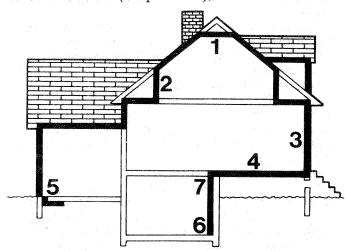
Areas in a home needing proper insulation: 1.) Ceilings with cold spaces above; 2.) Rafters and "knee" walls of a finished attic; 3.) Exterior walls or walls between heated and unheated spaces; 4.) Floors over unheated or outside spaces; 5.) Perimeter of a concrete floor slab close to grade level; 6.) Walls of finished or heated basement; 7.) Top of foundation or basement wall.
